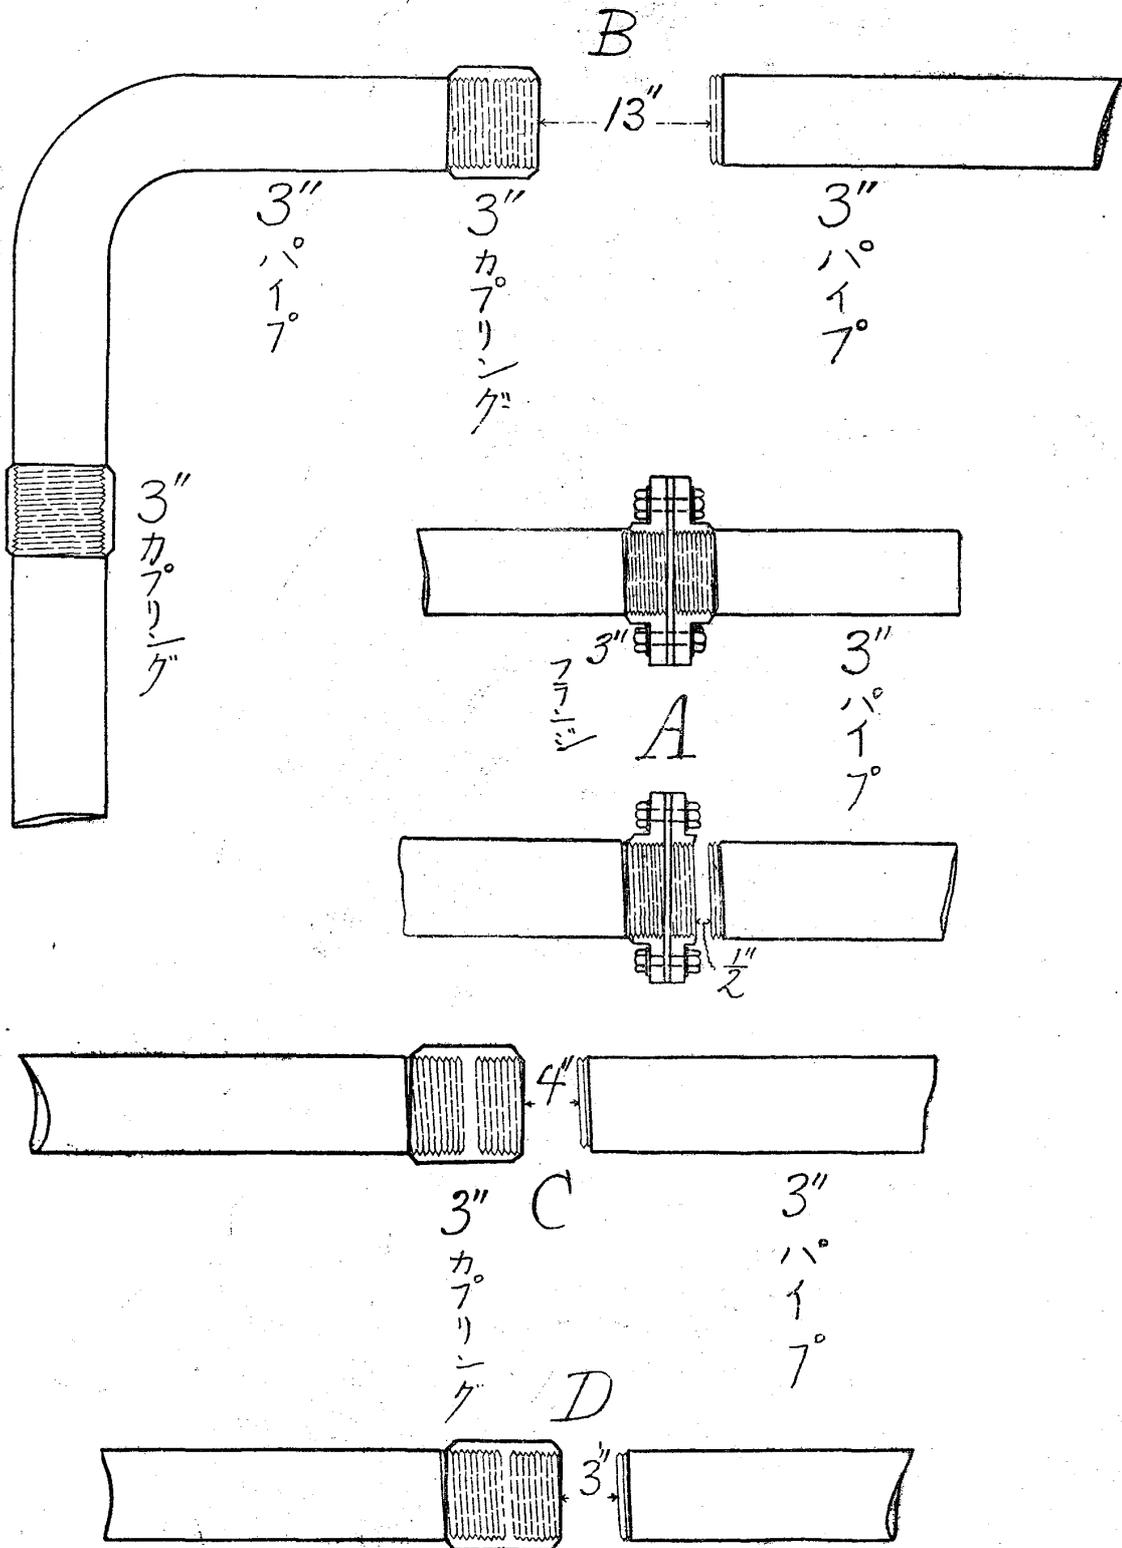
Joint Fracture of the 3'' Oil Pipes.
